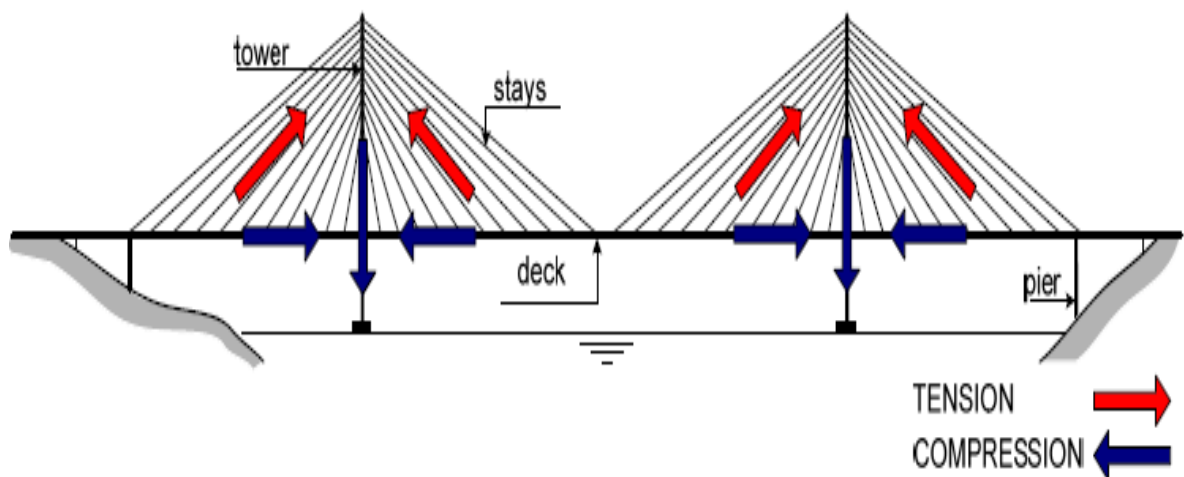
Tension and Compression of the Cable Stayed Bridge
